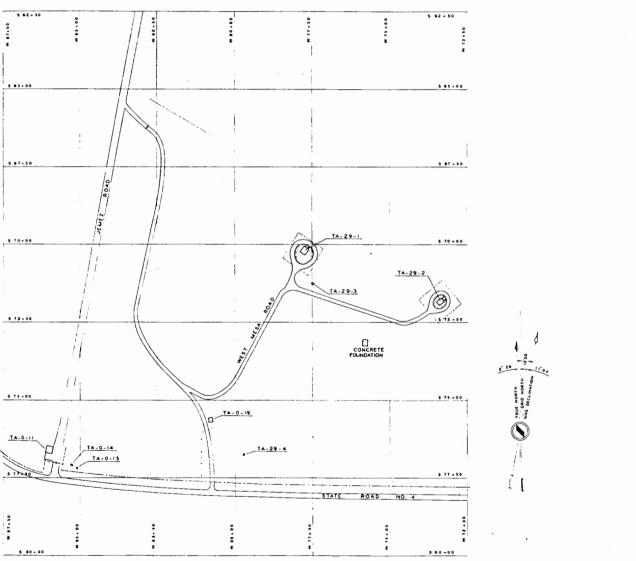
Structure Location Plan for TA-29 - Magazine Area-B (1955 Drawing from the LANL Technical Area Structure Location Plans)
